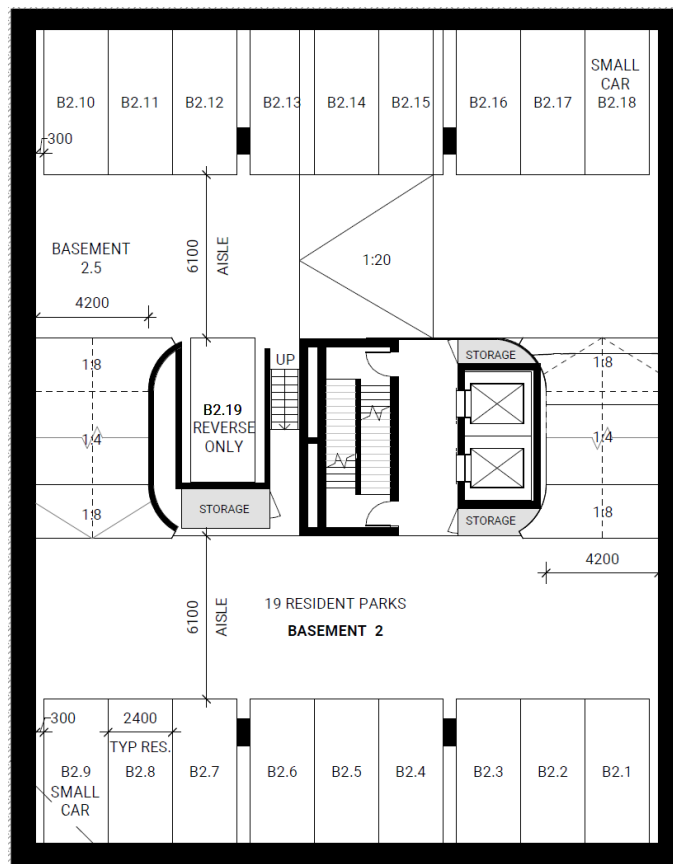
Proposed Basement 2 (Source: Plus Architecture)
